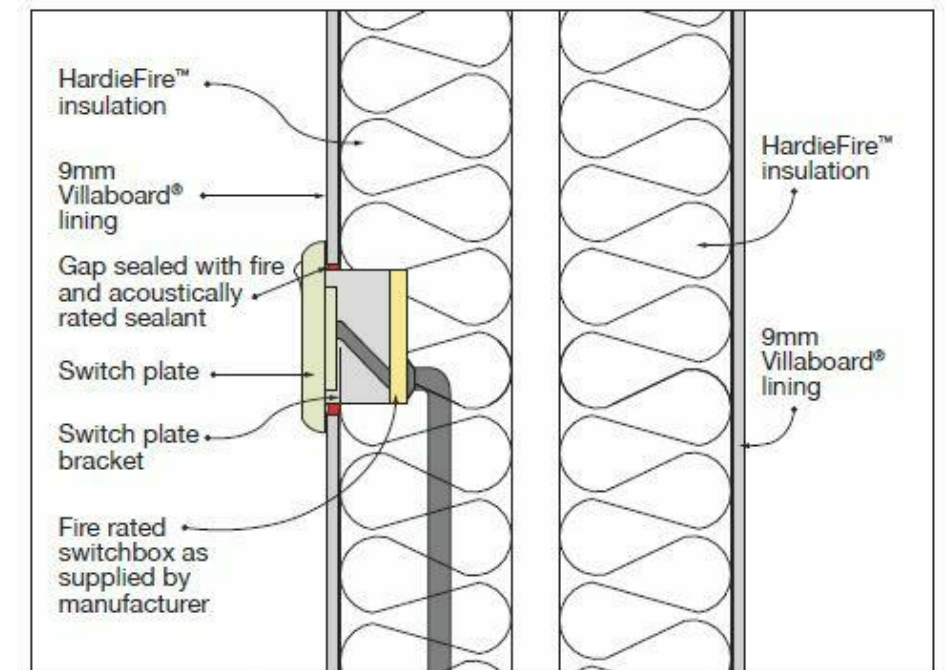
FIRE-RATED SWITCH PLATE OR GENERAL POWER OUTLET (GPO) ELEVATION
